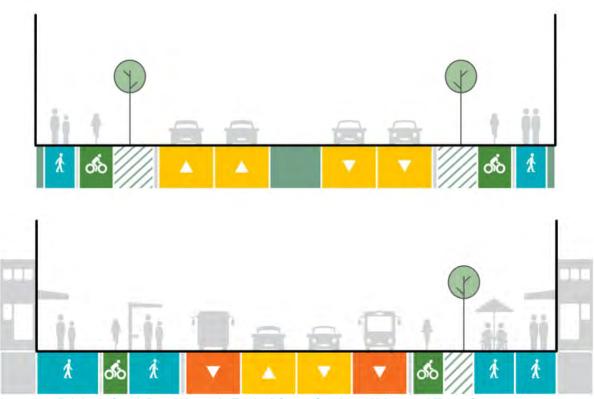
Brigham Creek Road Upgrade Typical Cross Section – Urban and Town Centre
